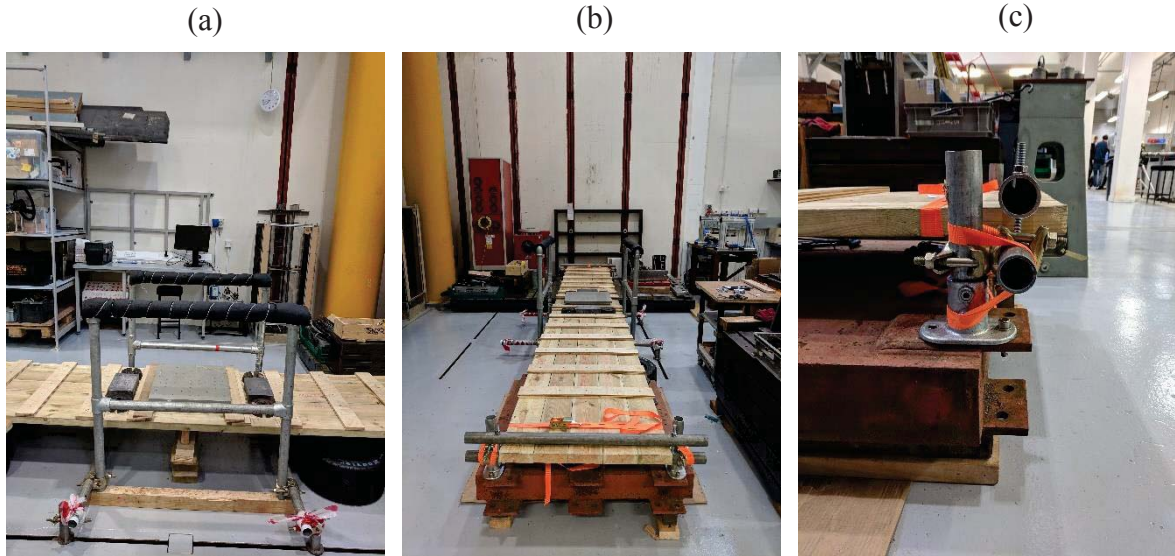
Breakdown of constructed bridge (a) Central jumping zone; (b) Length of bridge; (c) Bridge beam end-fixtures
